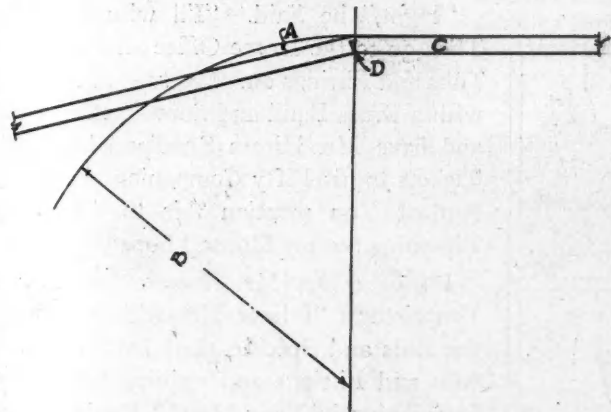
, Showing Simple Method of Finding Proper Distance Apart Saw Kerfs Should Be Cut.
